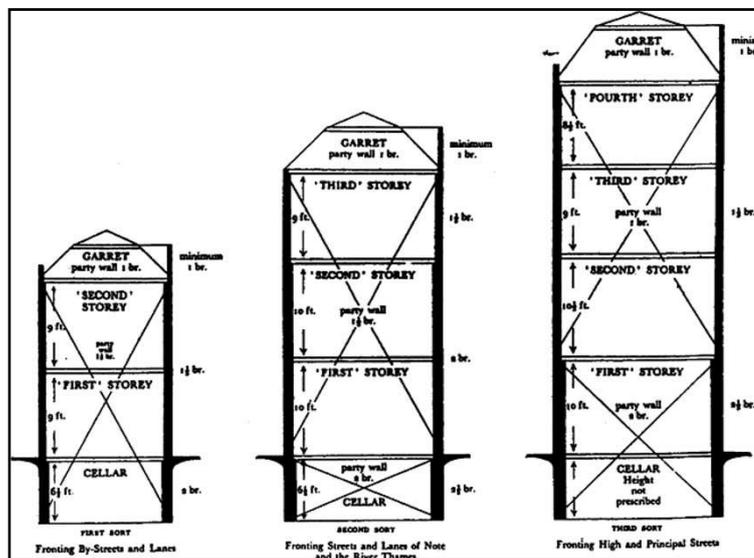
Details of types of buildings, Act for Rebuilding the City of London (1667)
